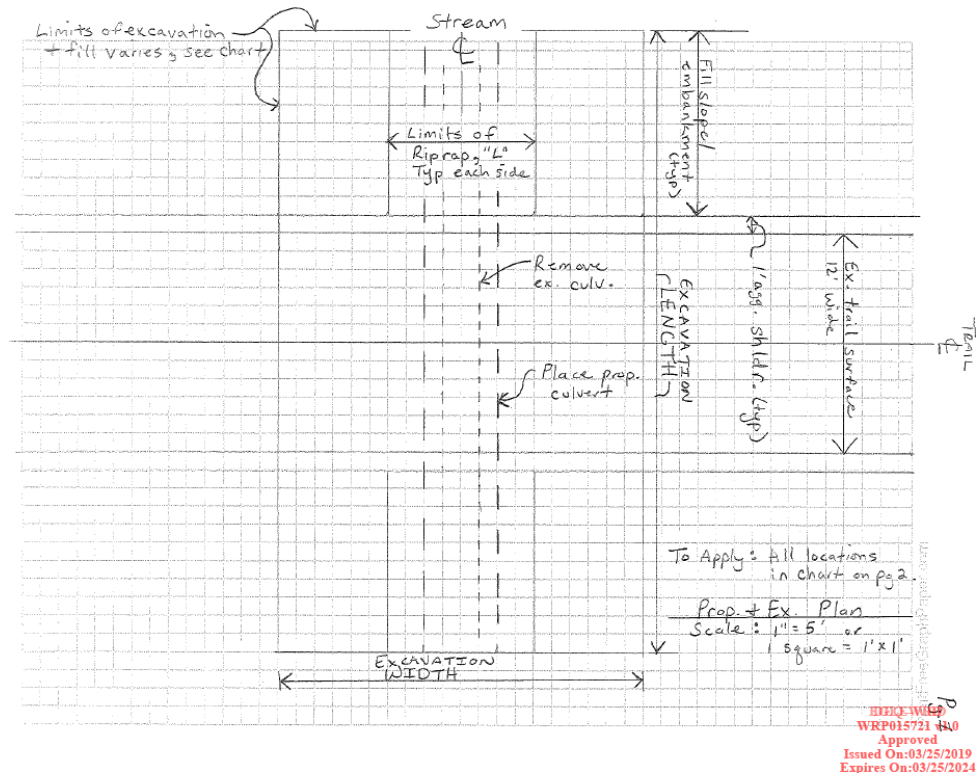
LLLG-15 Culvert Replacement Plan [18].
